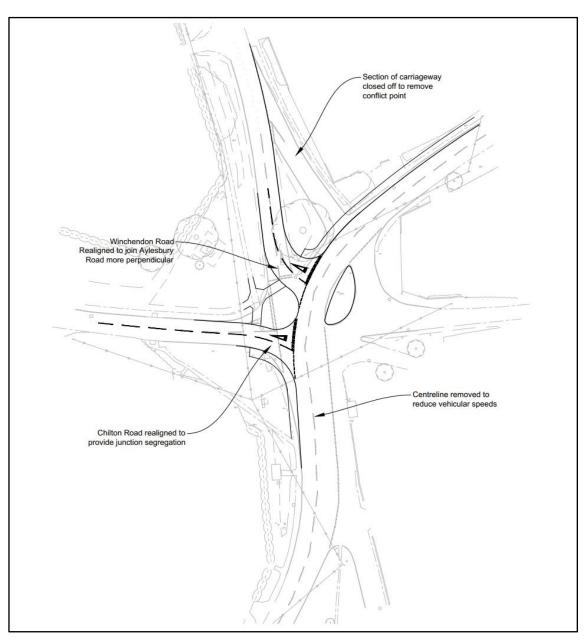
BWB Option 11 (Realignment of junction - Layout A)
